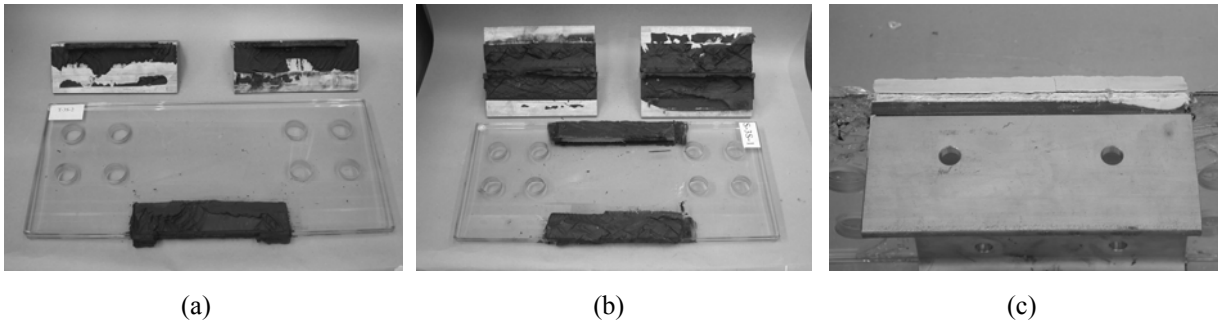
Specimen failure modes (a) transversal shear test (b) longitudinal shear test (c) compressive test
